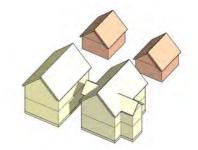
Basic massing, articulation, and opening strategies should relate to each other and break down the scale of the building.
